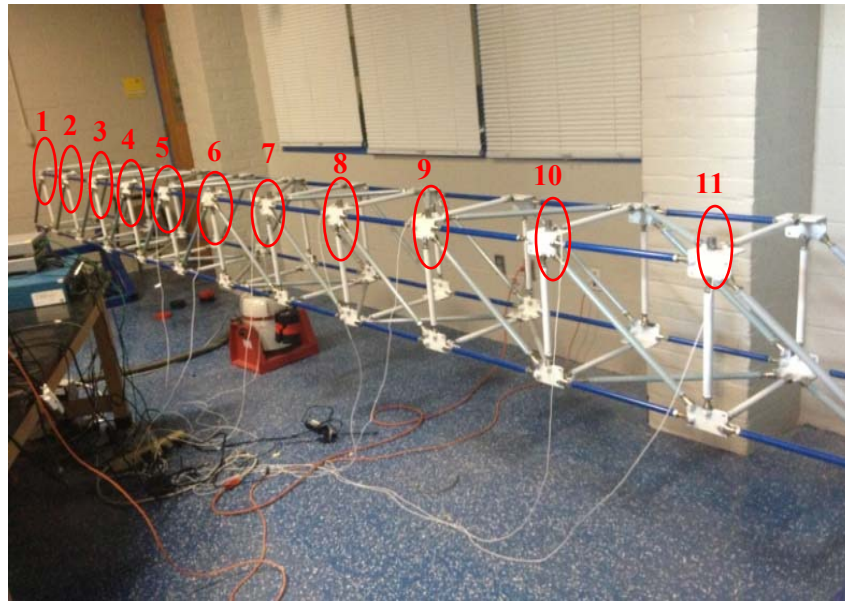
The 12-bay lab-scale truss bridge for damage detection with wired monitoring system
